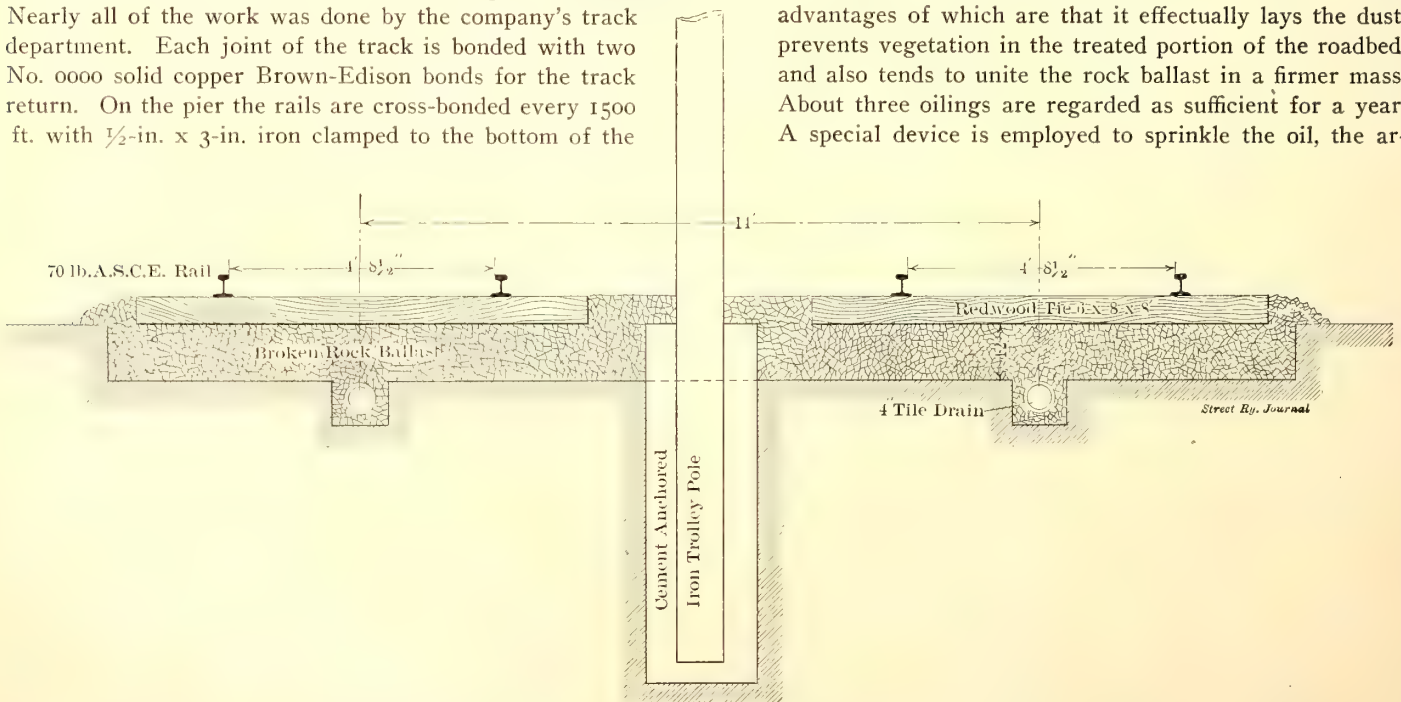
SECTION SHOWING TRACK CONSTRUCTION AND POLE SETTING
